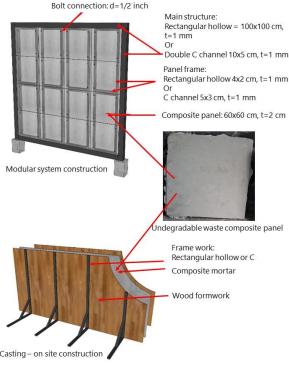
Comparative study of Installation and Connection Design of Prefabricated Wall Panel
